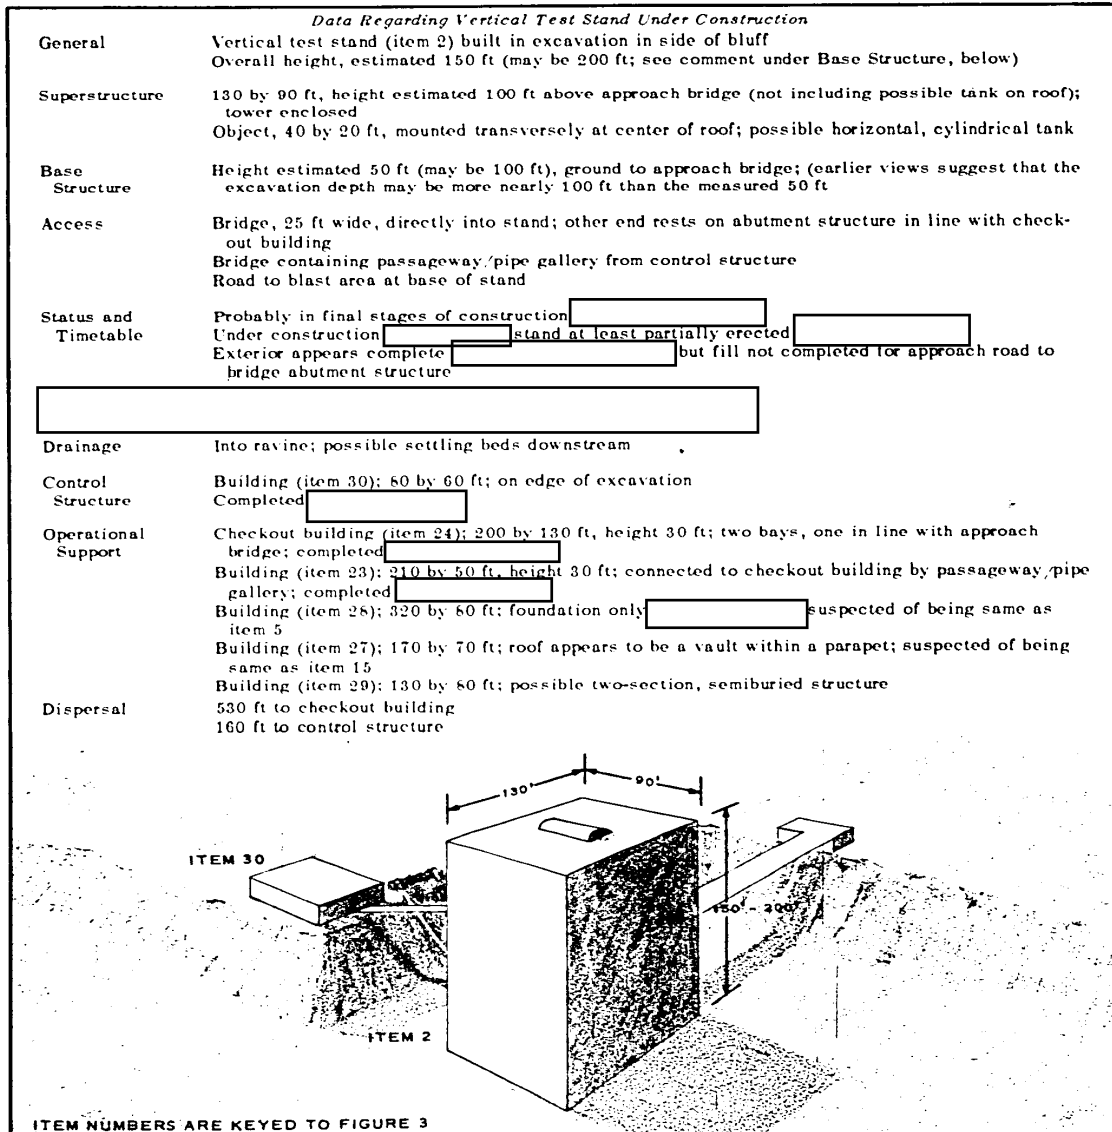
VERTICAL TEST STAND UNDER CONSTRUCTION (Item 2, Figure 3).
